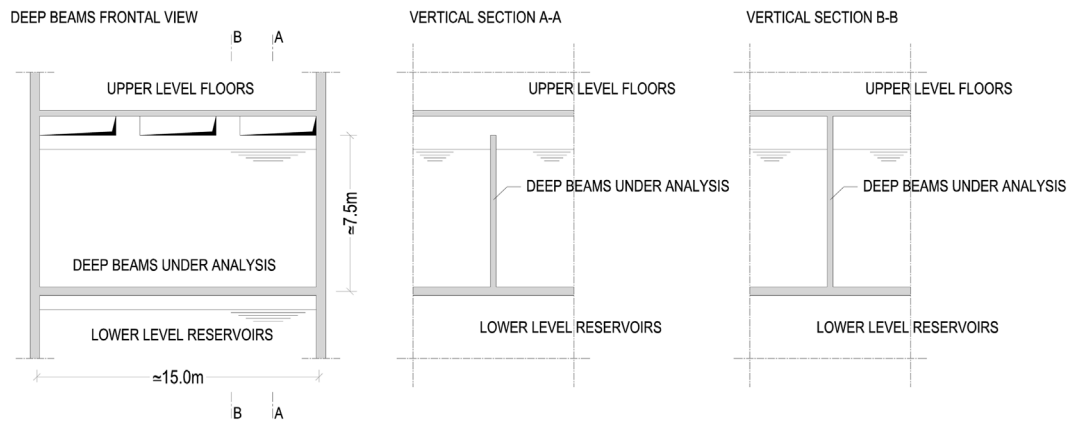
Schematic layout of the deep beams in the water treatment plant design proposal
